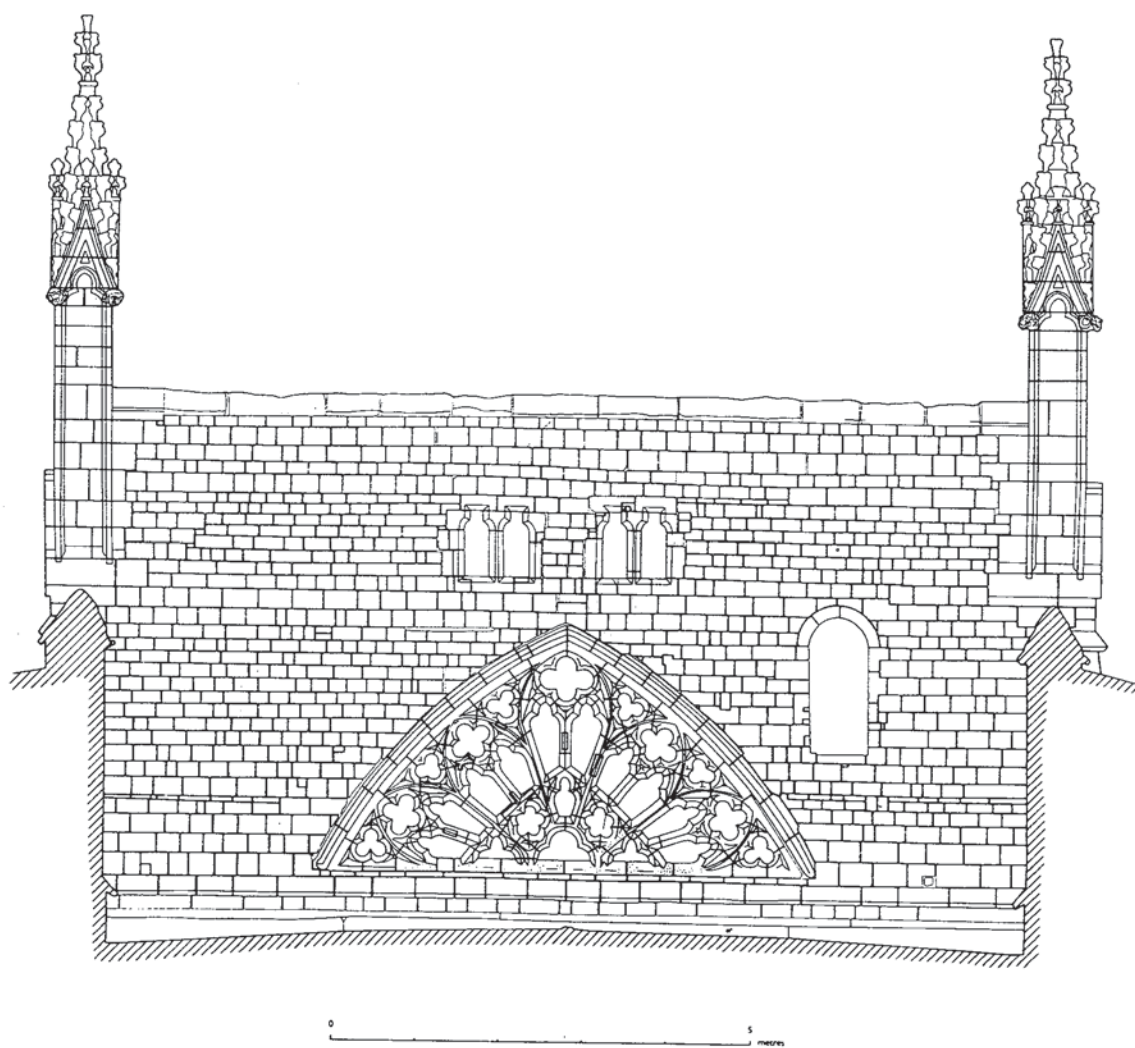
Survey elevation of the Cathedral Lady Chapel east wall.
